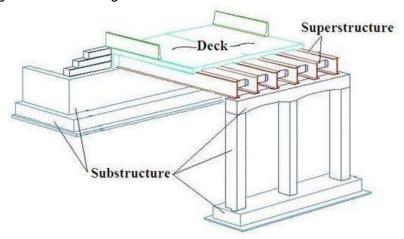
Three Main Structural Elements of a Bridge [1]
